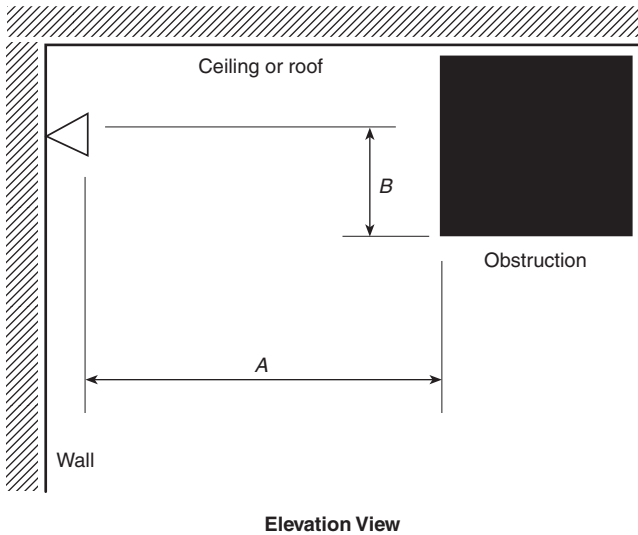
(a) Positioning of Sprinkler to Avoid Obstruction (Residential Sidewall Sprinklers).
